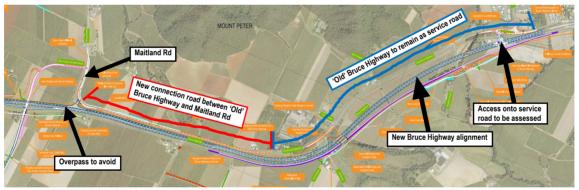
Under-construction Bruce Highway service road connection to Maitland Road
